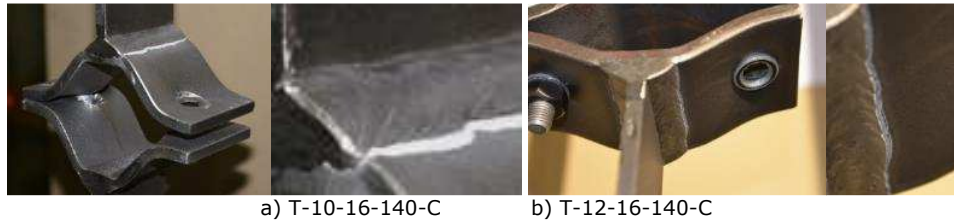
Cracks near the welding for the specimens with largest deformations: [142]
